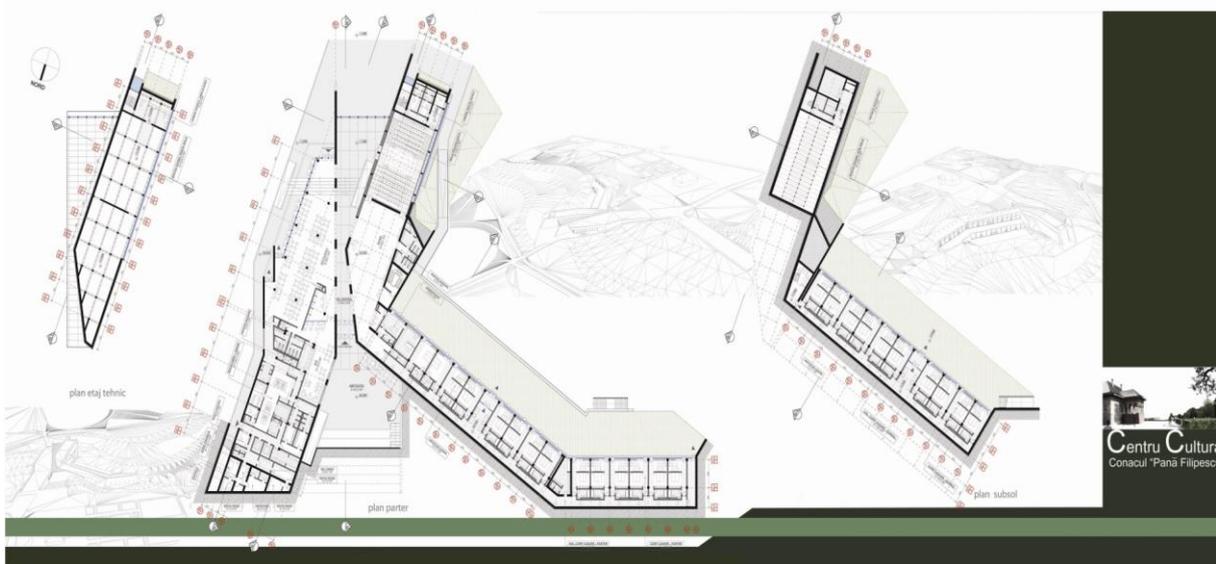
Ground floor plans sheet of Cultural Center “Pană Filipescu Mansion”
